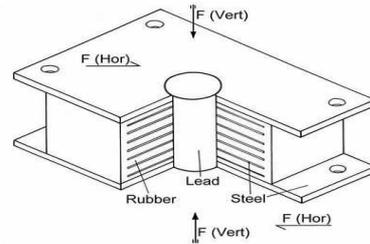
Rubber Bearing with Lead Plug Inside(LRB)
